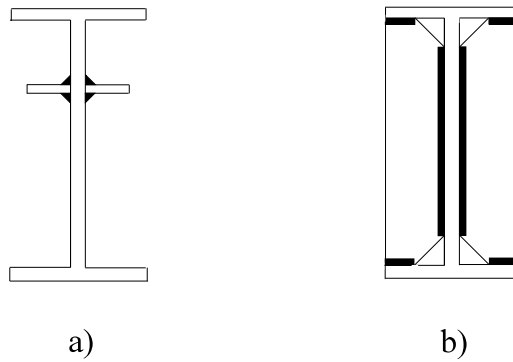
Girder Attachments: a) Longitudinal Stiffener, and b) Transverse Stiffener
